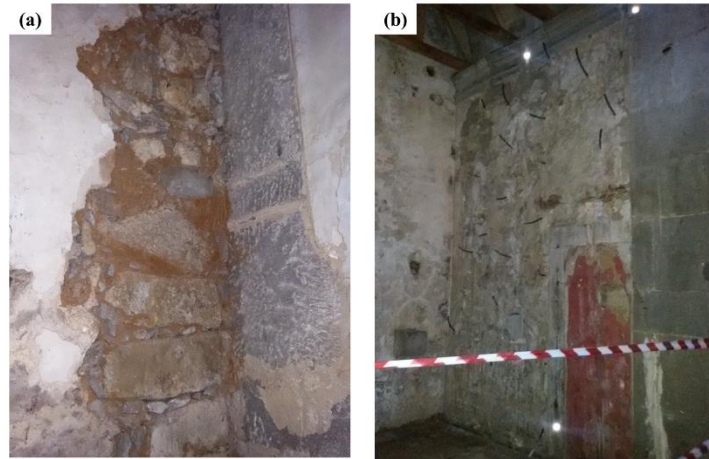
Details of the chapel walls: (a) wall without mortar layer and (b) detail of the wall after the retrofitting.
